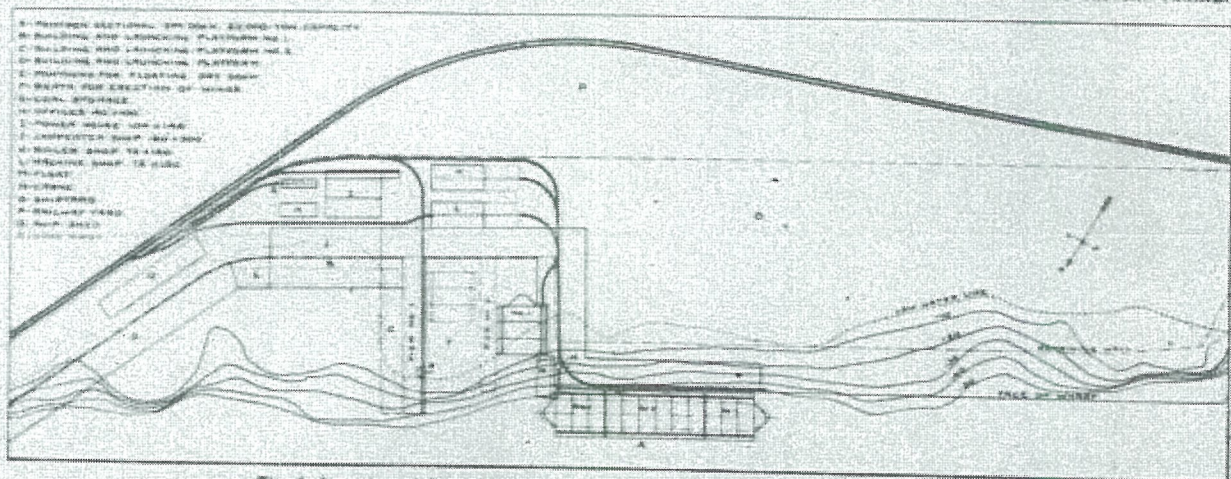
Location of Drydock, Ship repair and Shipbuilding Plant, Prince Rupert.
